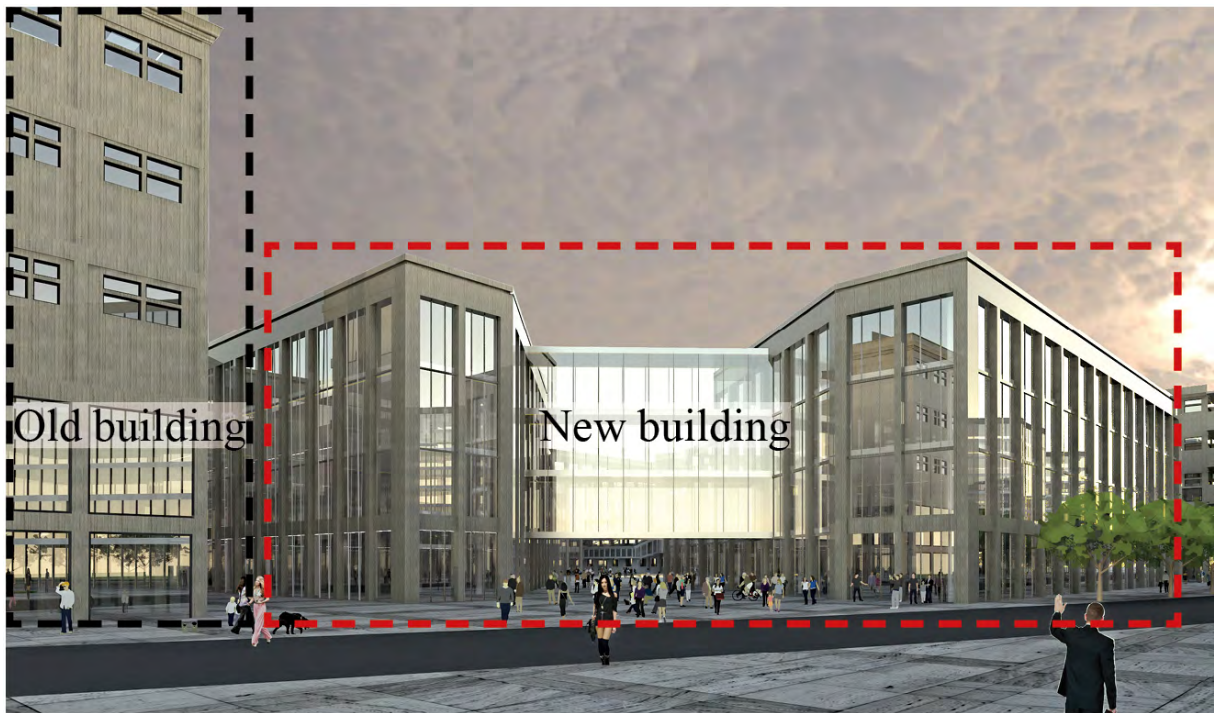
Reconstruction design of the exterior wall color of Nanjing Hutchison factory historical building (Source: Zhou Qi studio design)
